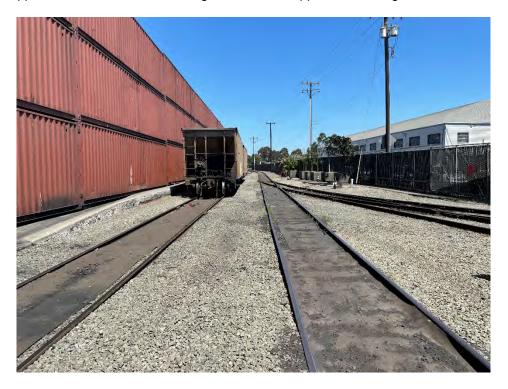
Looking north along South Fourth Street in SW-3 area. Gravel cover in good condition with no geotextile exposed.
